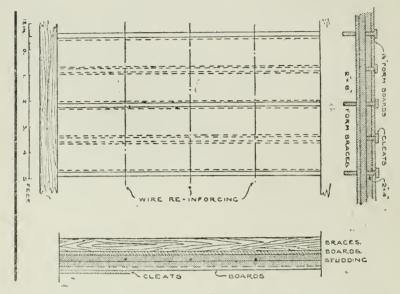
Showing Method of Building and Reinforcing Walls.
